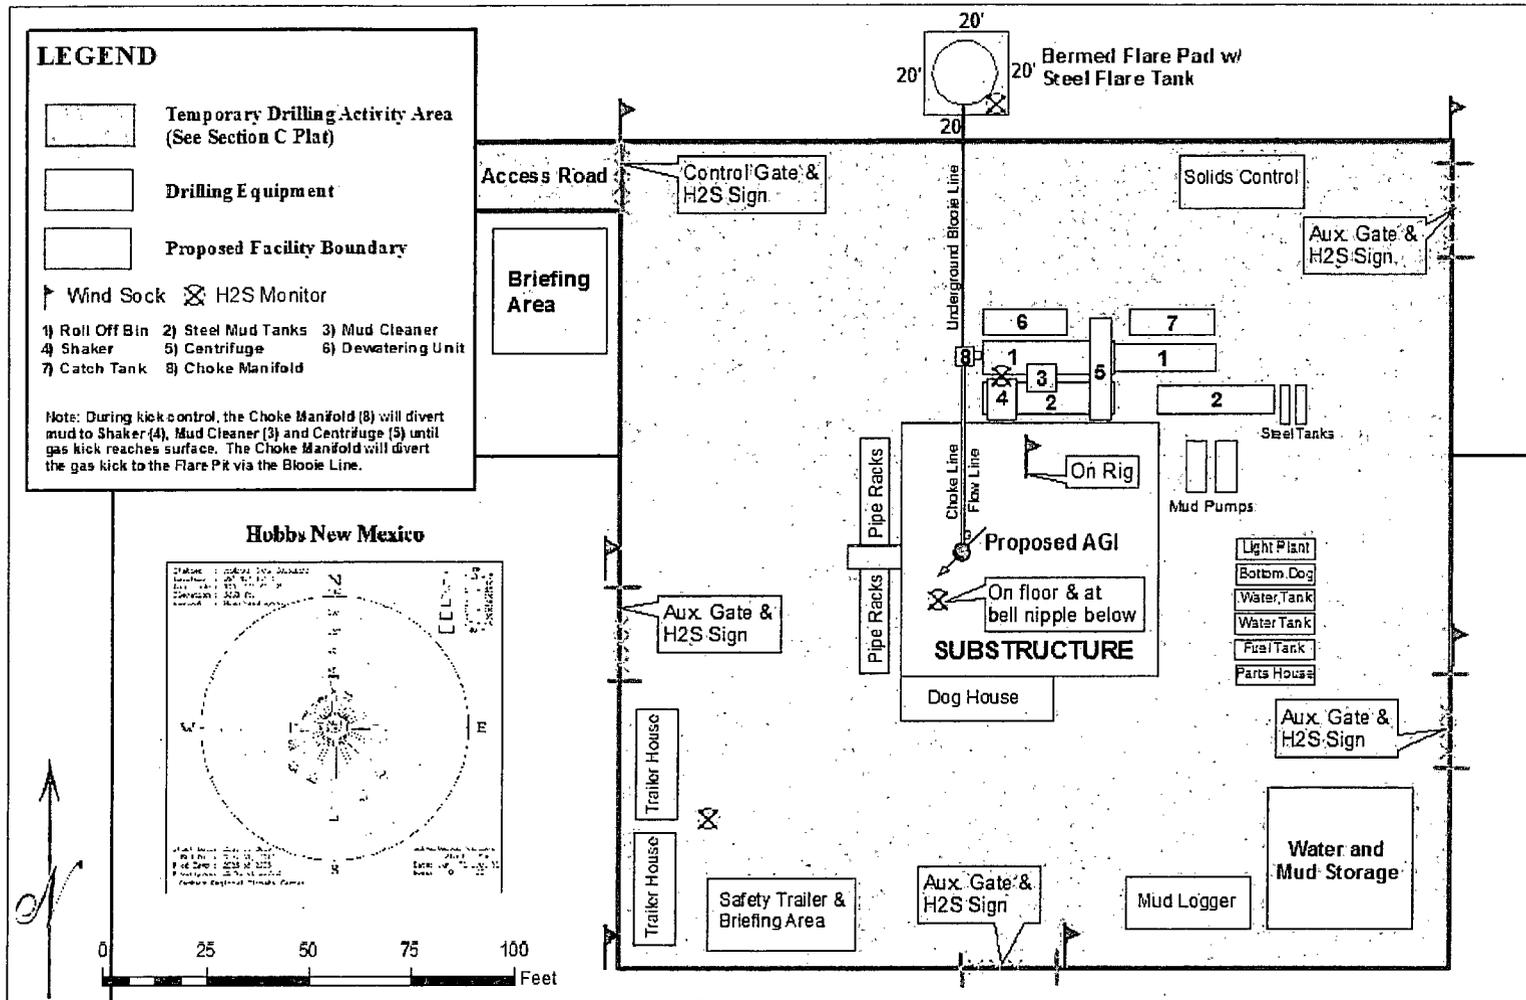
Site Plat Showing H2S Safety Features and Closed Loop System
